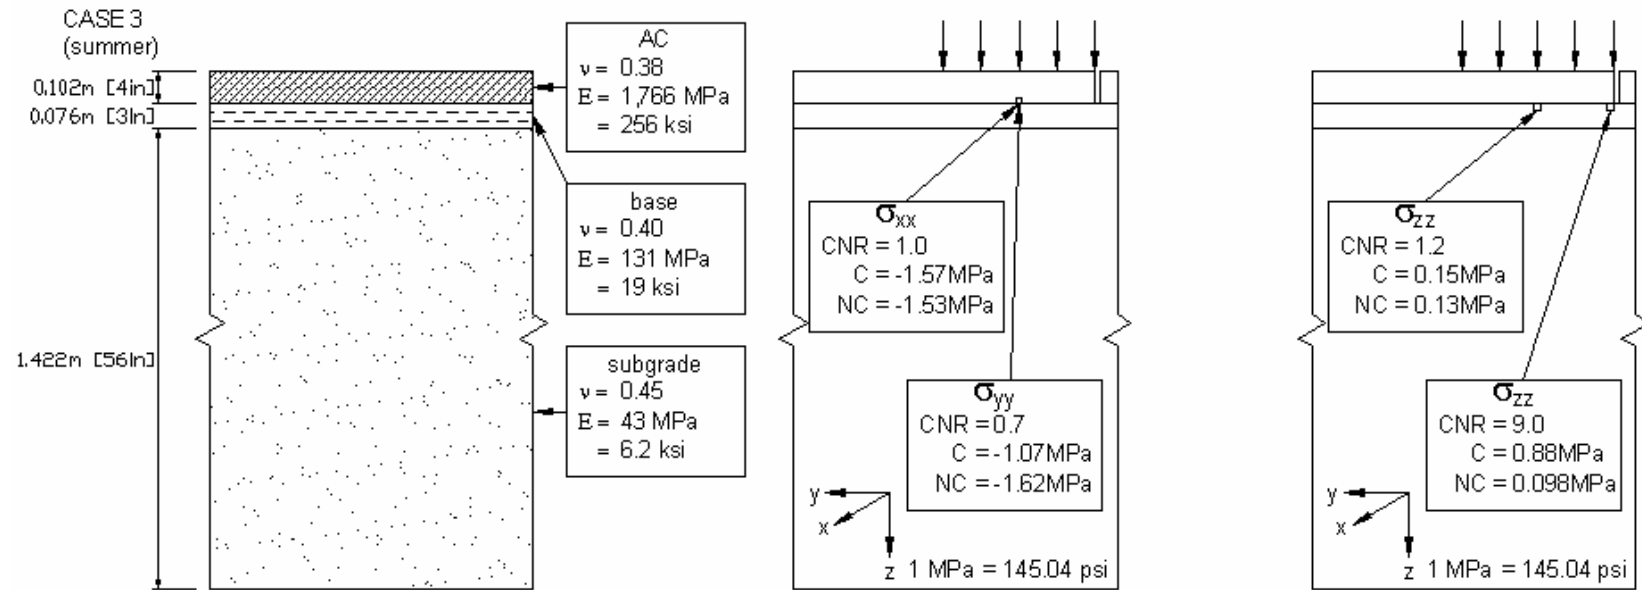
Summary cross section for case 3, AC = 0.1 m, base = 0.076 m, and sand subgrade = 1.42 m (C – stress in cracked pavement, NC – stress in pavement with no crack, CNR – crack/no crack (stress) ratio)
